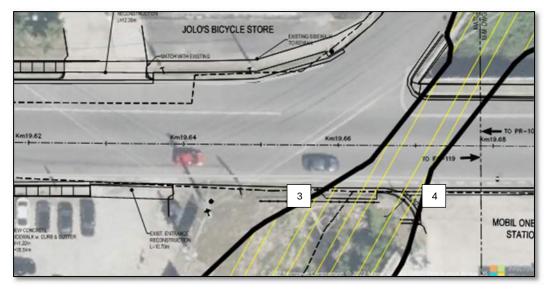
Design for proposed activities inside floodway limit and photos key plan (Location 2).
